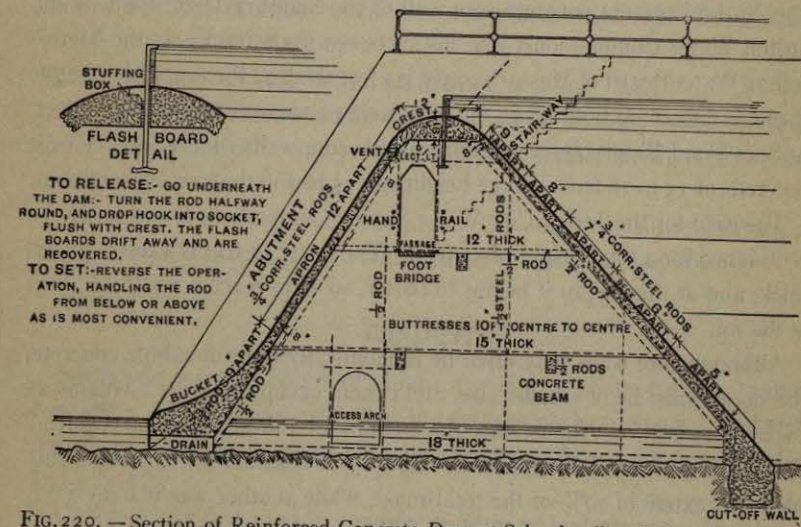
Section of Reinforced Concrete Dam at Schuylerville, N. Y. (See p. 677.)
